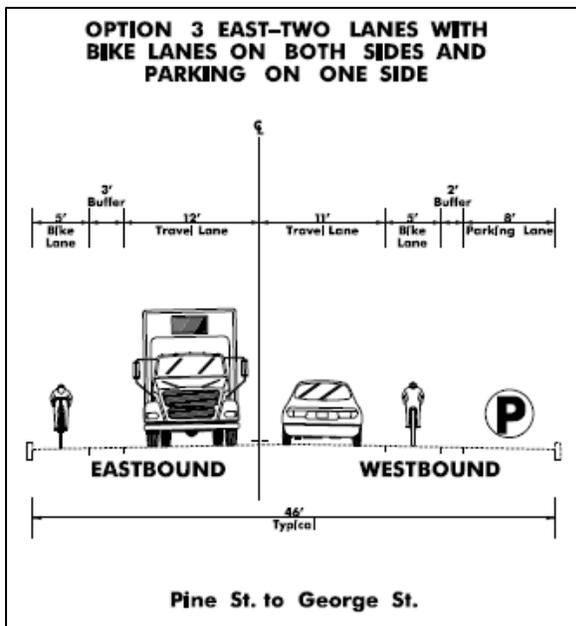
Two-Lane Roadway Cross Section with Bike Lanes on Both Sides and Parking on North Side – East
